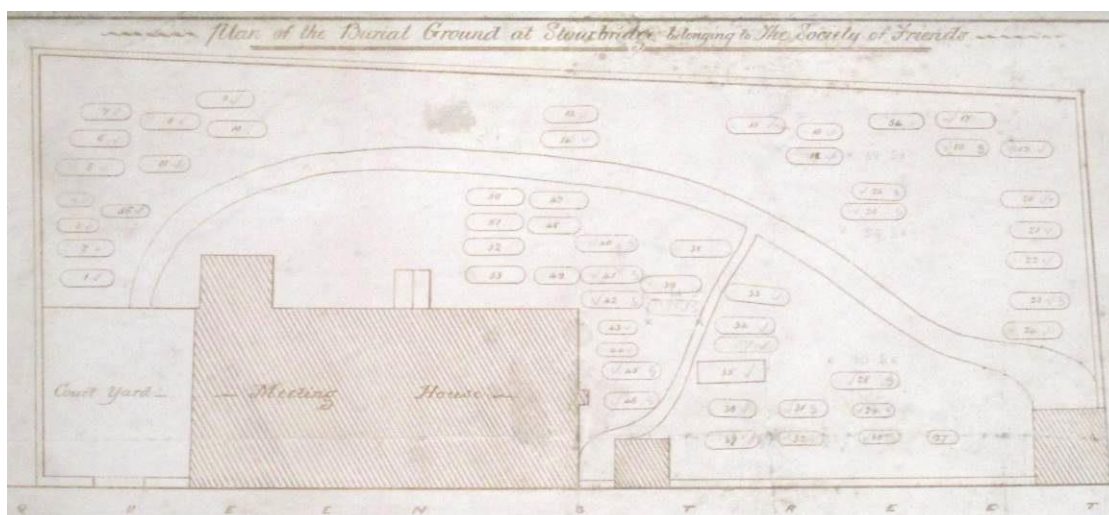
Plan of the burial ground, undated (Stourbridge MH Archive)
